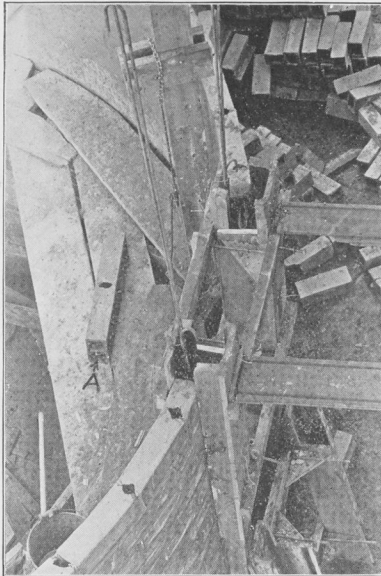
Looking down upon forms for Continuous Door Frame and Steel in place Ready to Fill with Concrete.
